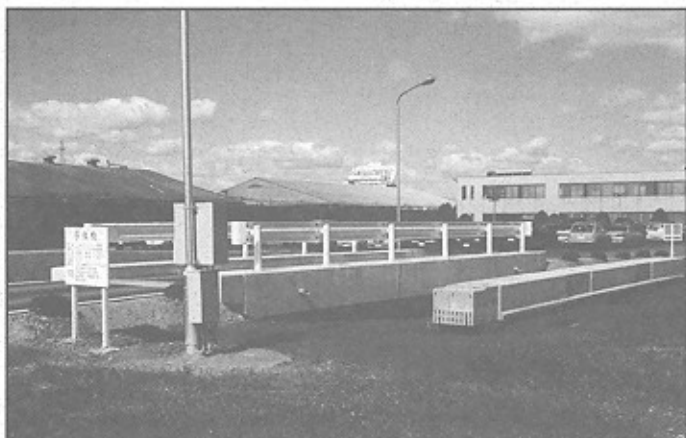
New CFRP Tendons ("COMPOSE") Used for Mugen Bridge, Japan
